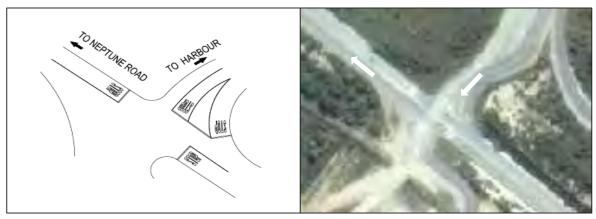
Geometric layout and aerial view of the intersection just before Neptune Road
